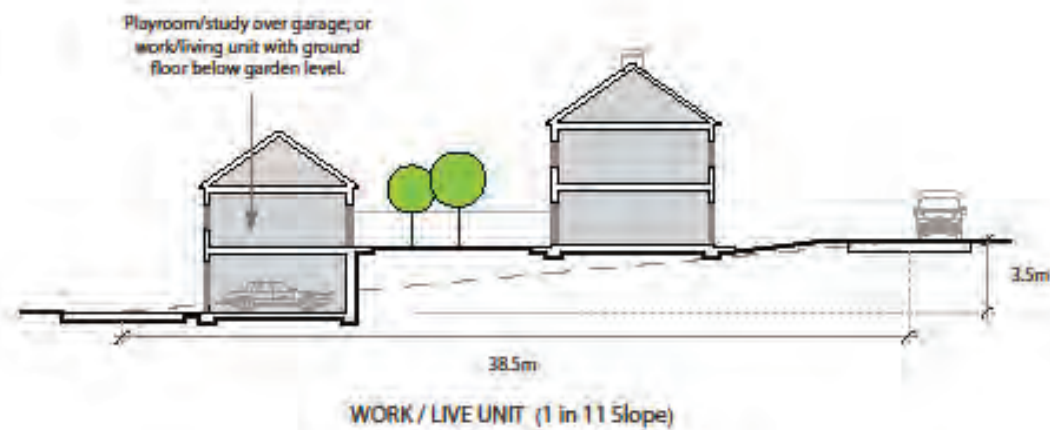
House with lower level parking on mews to rear, with possible future garage/playroom
